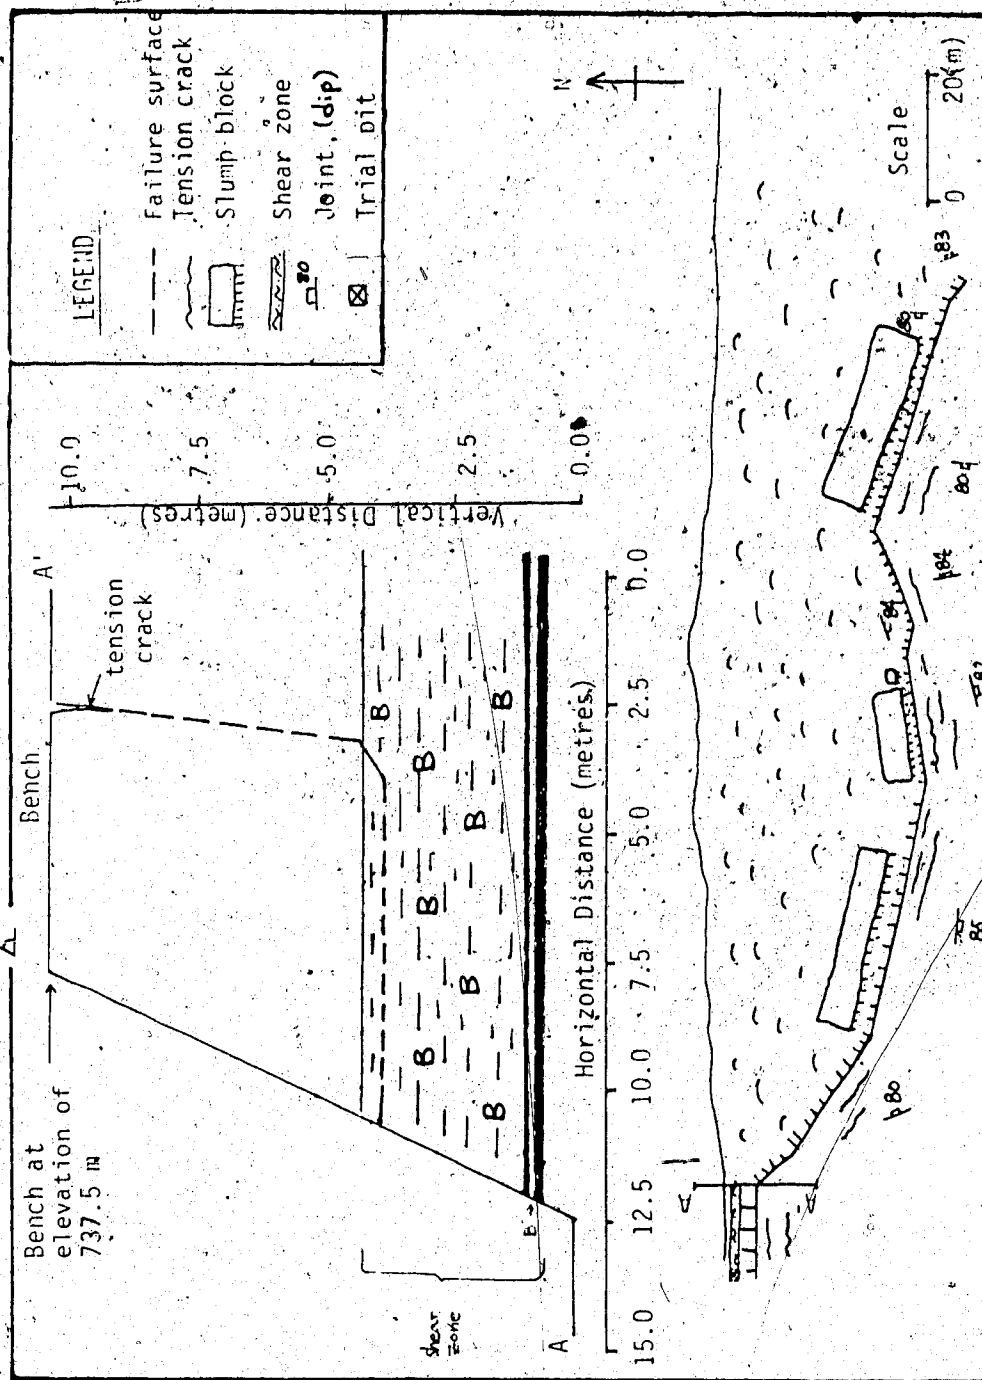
Plan View and Profile of Slide 1, Pit 3,
